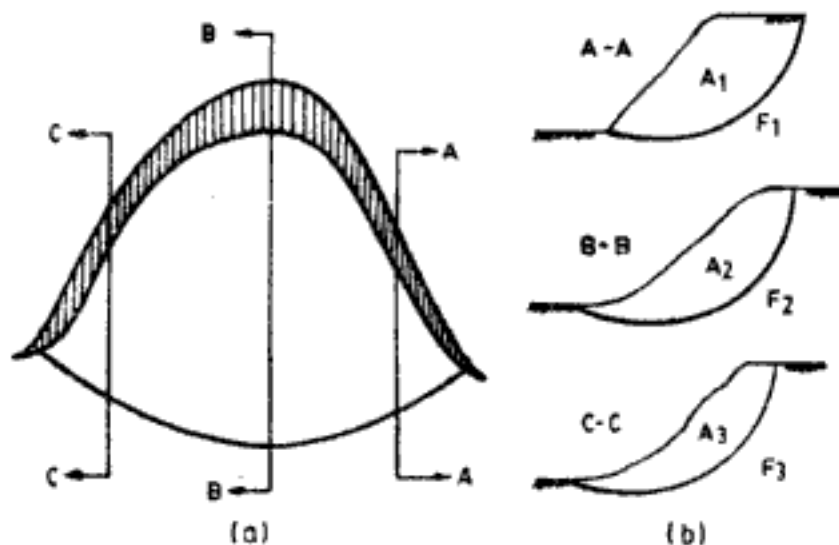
(a) Plan view of three-dimensional slope and (b) cross-sectional views through sections *A-A*, *B-B*, and *C-C
